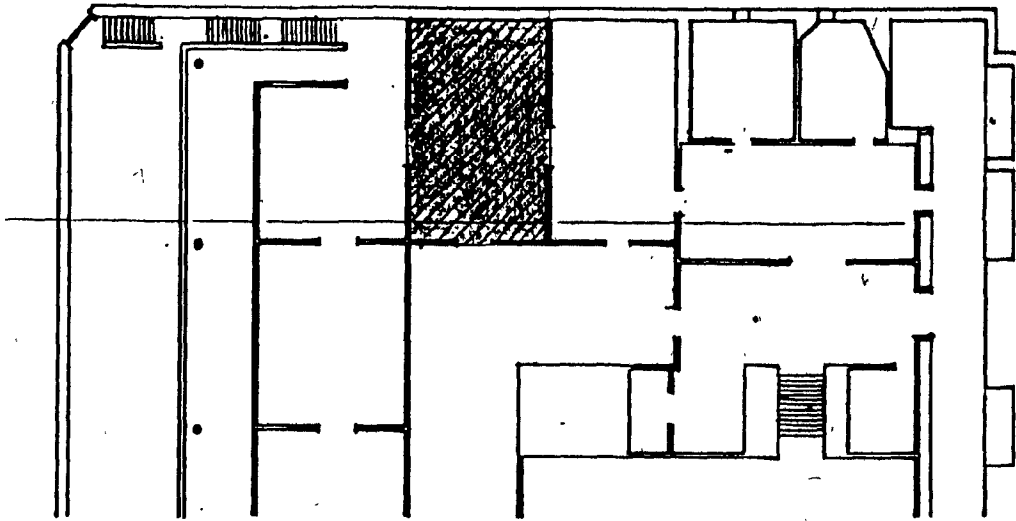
, The second floor plan, gallery 218 is shaded.
